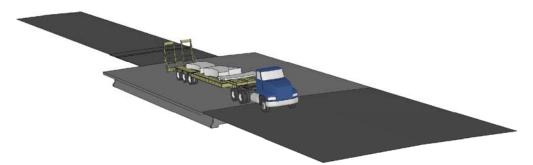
FE model of the bridge without railing barriers used for simulations
